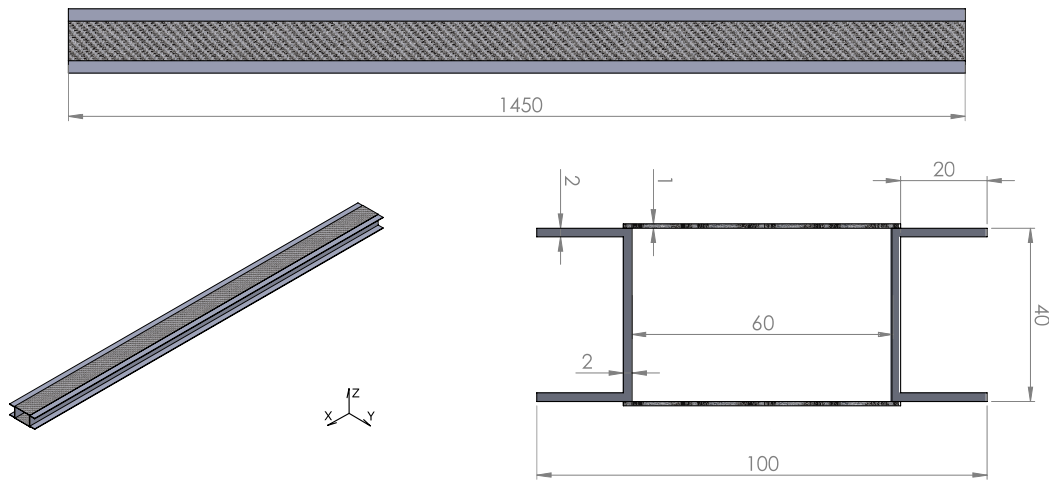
UD Carbon FRP Beam - Geometry and dimension in mm
